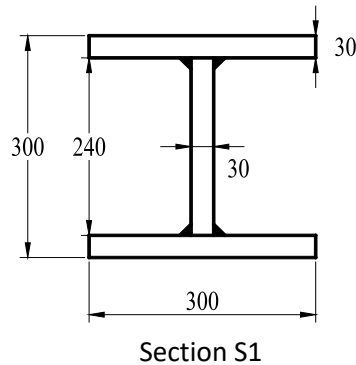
Nominal cross-sectional dimensions of S690 welded H-sections
